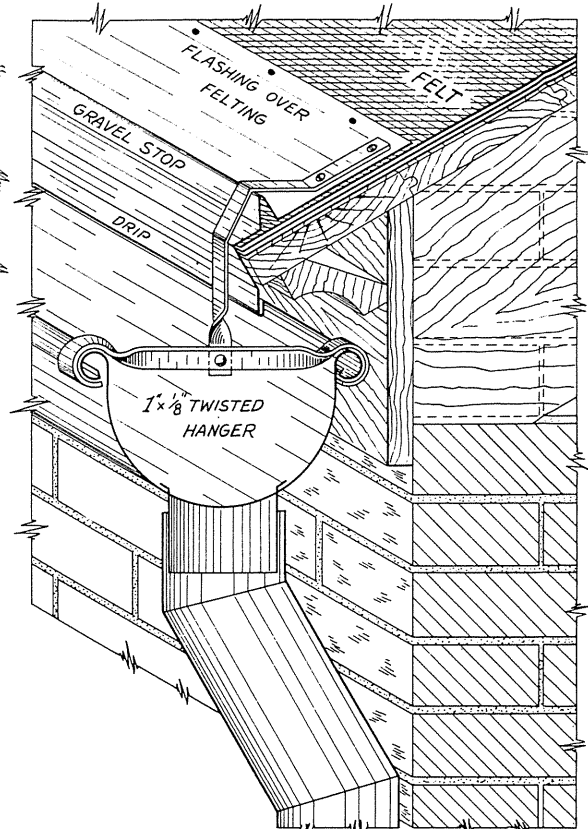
DOUBLE BEAD EAVE TROUGH WITH TWISTED HANGER FOR COMPOSITION AND FLAT TILE ROOF INSTALLATION
